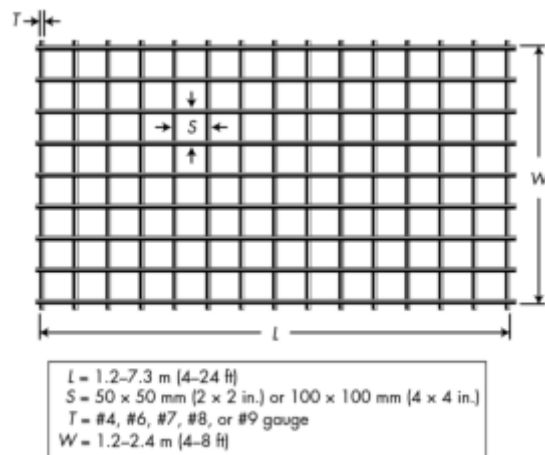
Welded Wire Mesh (typical dimensions) (Hadjigeorgiou & Potvin, 2011, p. 574)
